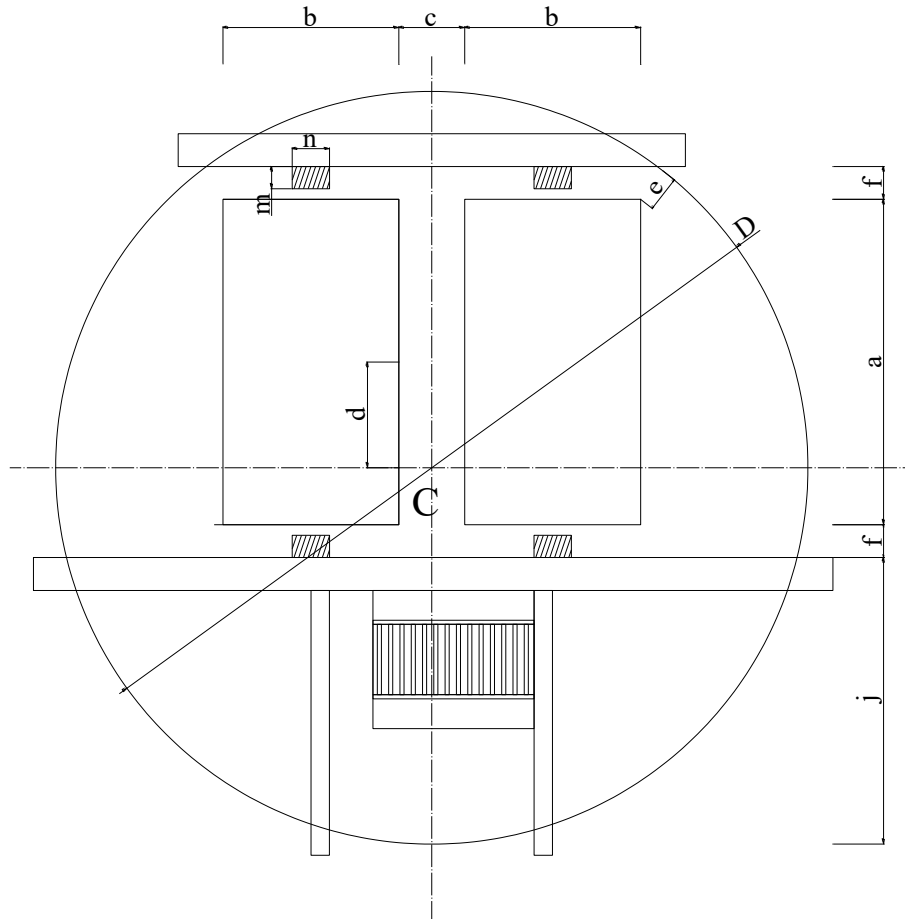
Shaft with a circular cross-section (two skips, pass-through section)
